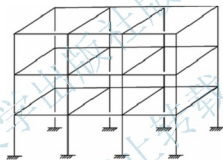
An apartment building with the main load-bearing structure constructed of beams and columns.
